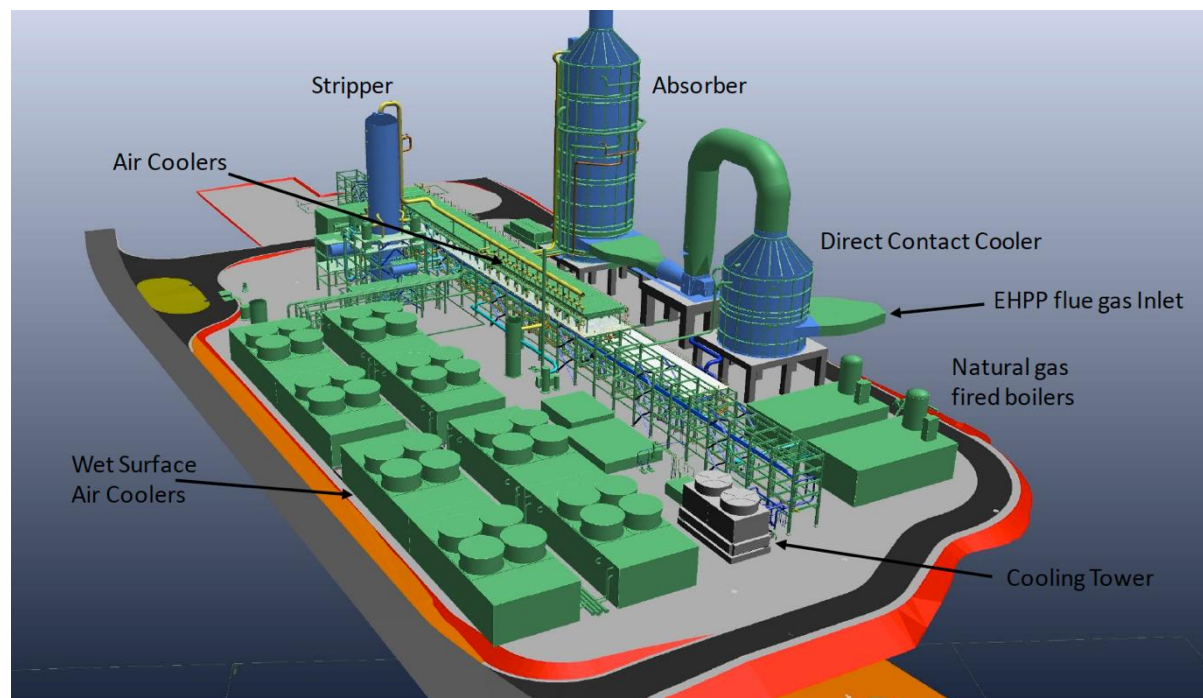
Depiction of Process Equipment as Installed: Elk Hills Power Plant
